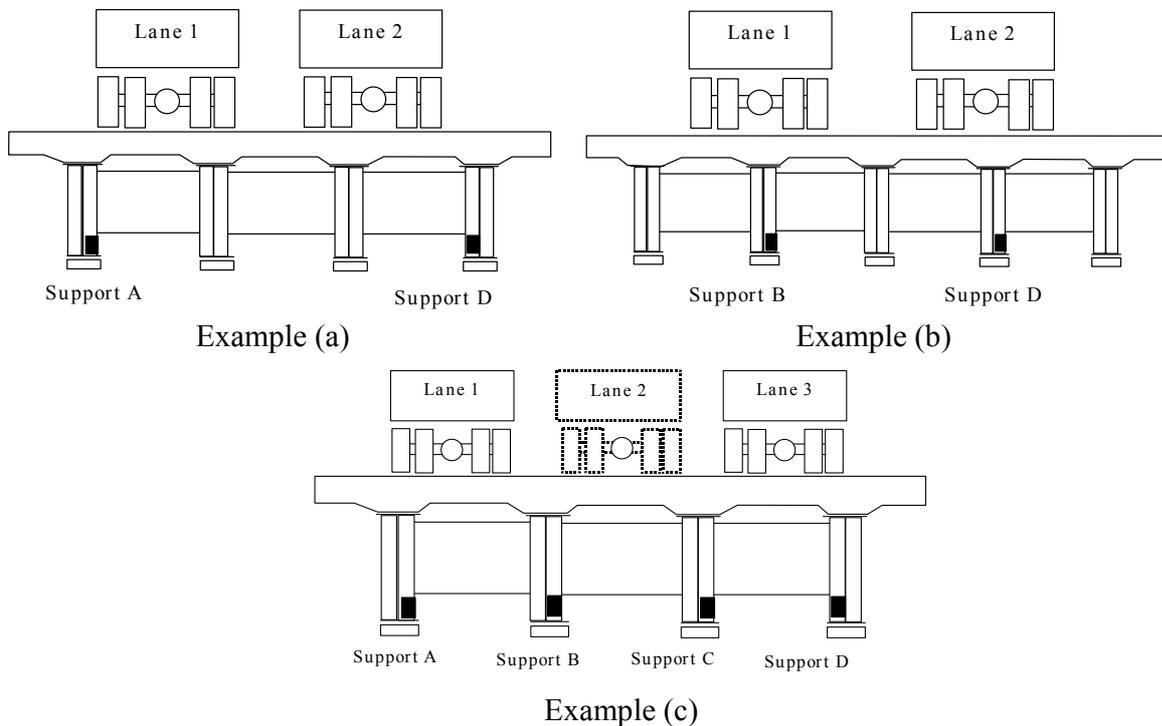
Examples of Sensor Arrangements in Steel Plate Girder Bridges
